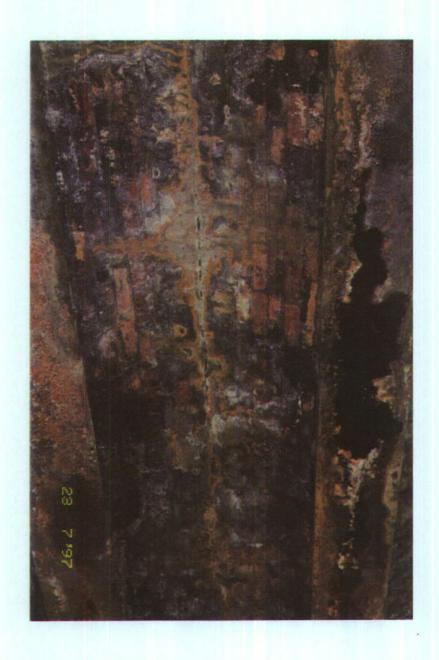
OPEN JOINT AT JACK ARCH CROWN WITH LEACHATE EMITTING FROM JOINT
